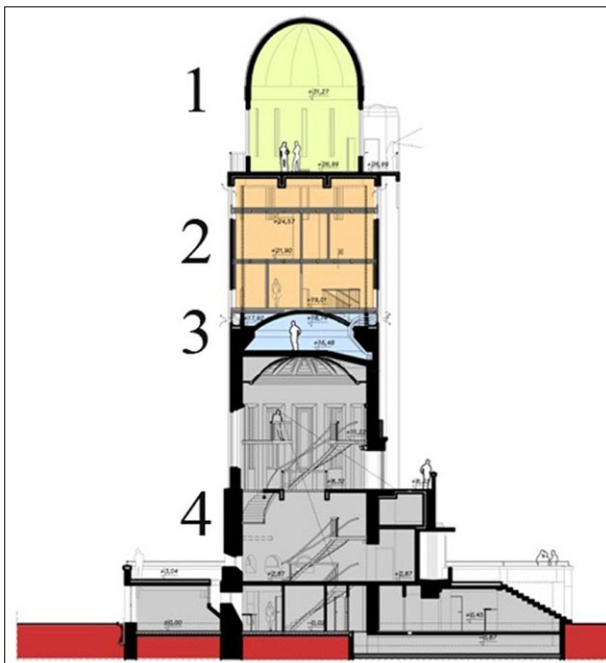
Vertical cross section, 1) view terrace, 2) rooms for rent, 3) technical space, 4) catering and exhibition area; design: P. Opalka, 2008
